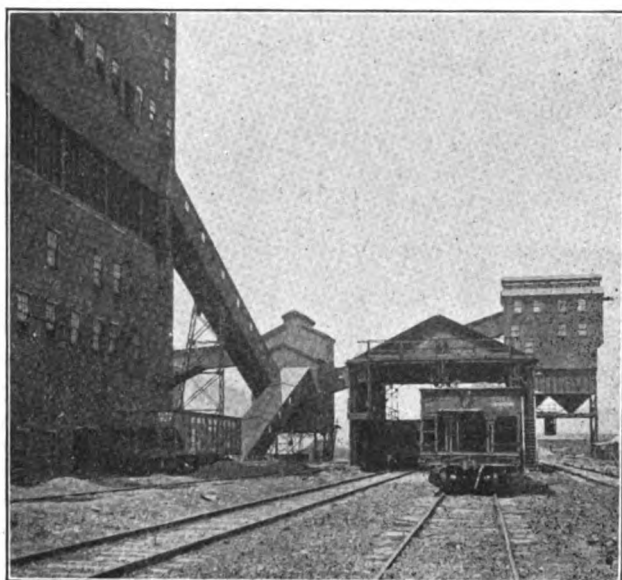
Left to right: Coal crushing and mixing building; junction tower; coal to coke plant or steel work; rail coal to coke plant; right-rear, river coal to railroad cars for plant use.
